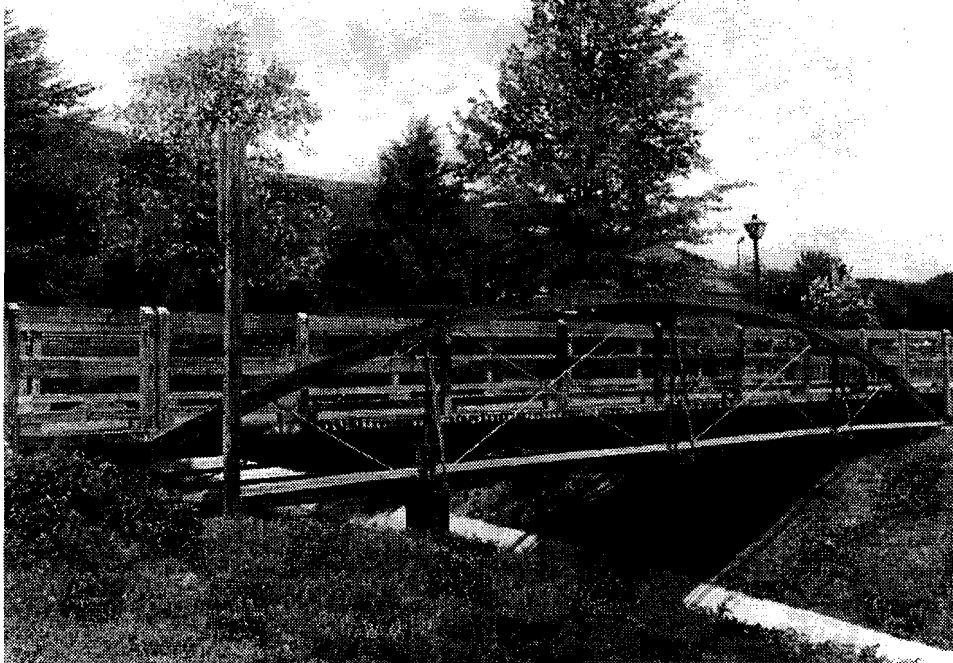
Pony Bowstring Arch Truss Built in 1878. Now at Ironto Wayside, Montgomery County.
